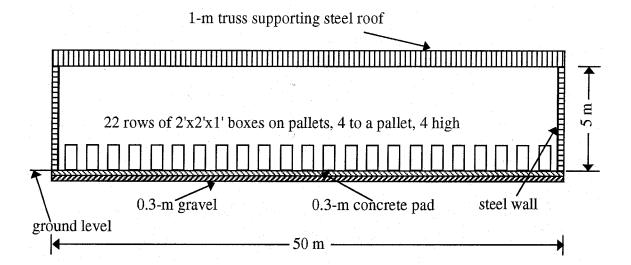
Elevation View of a Storage Building with Storage Configuration
